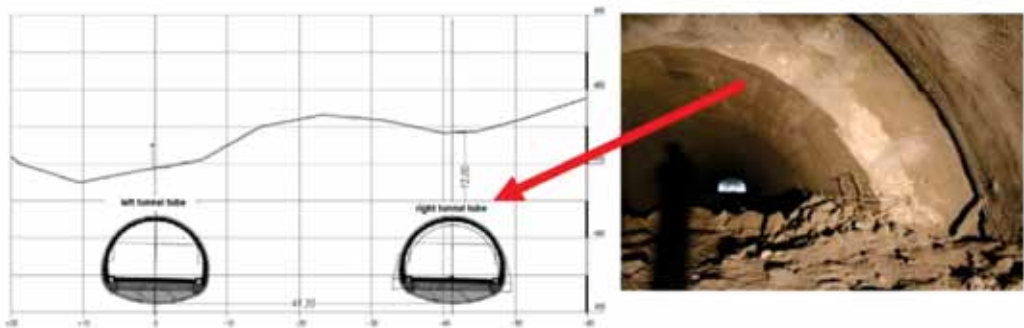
Cross-sections of the left tunnel tube and right tunnel tube which was reconstructed.
